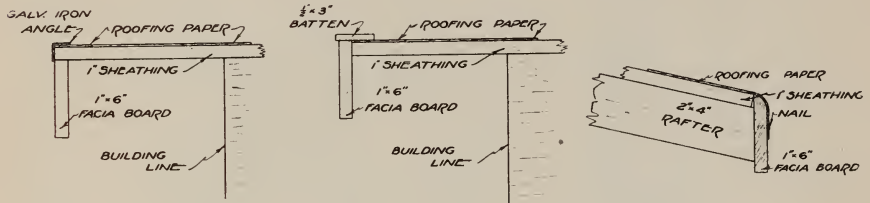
Methods of fastening roofing paper at the edges of the roof.
